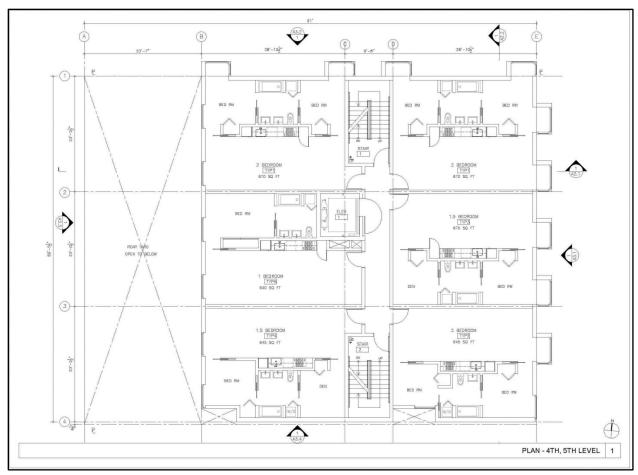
FOURTH AND FIFTH LEVELS PLAN
